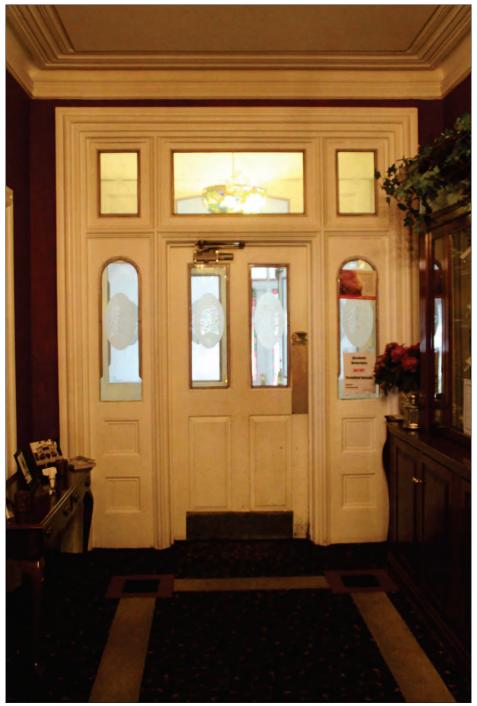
inside front door, transom & sidelights (replacement glass), ceiling moulding
